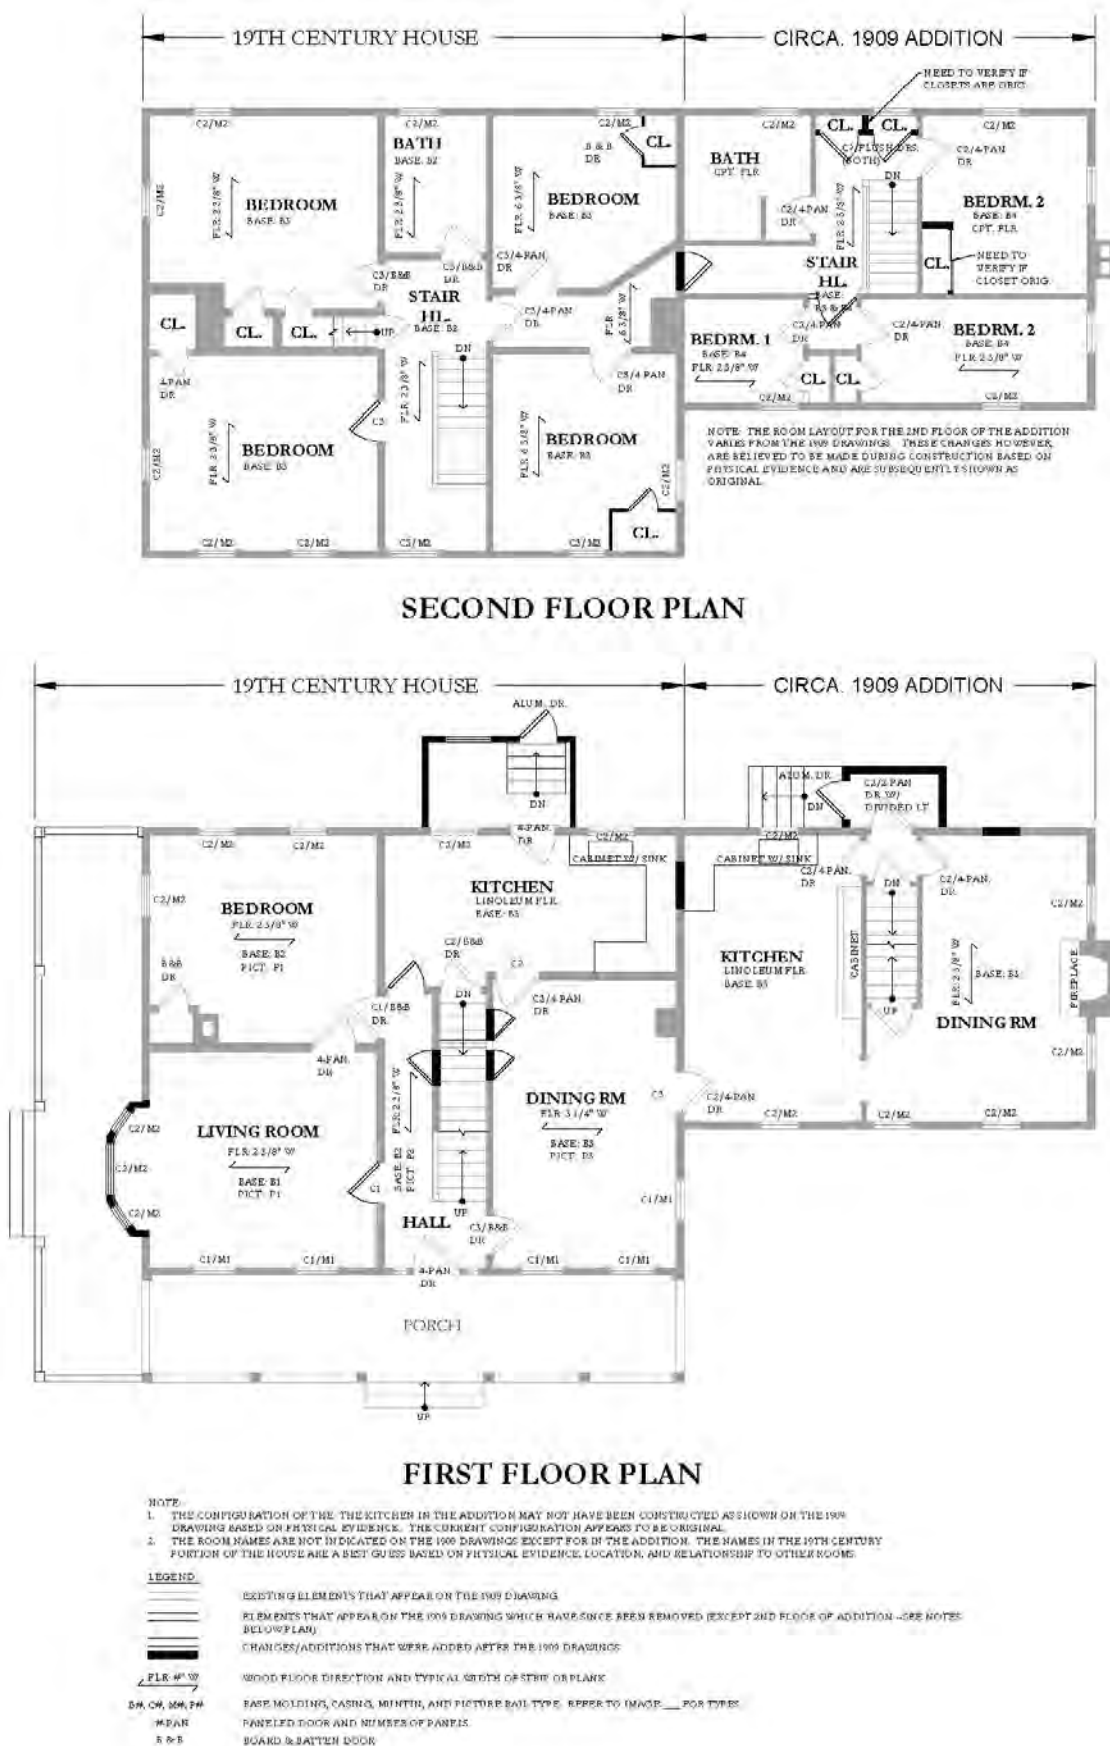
First & Second floor plans showing believed alterations and information regarding flooring, doors, and trim. (AKRF, Inc/HA, 2016)
